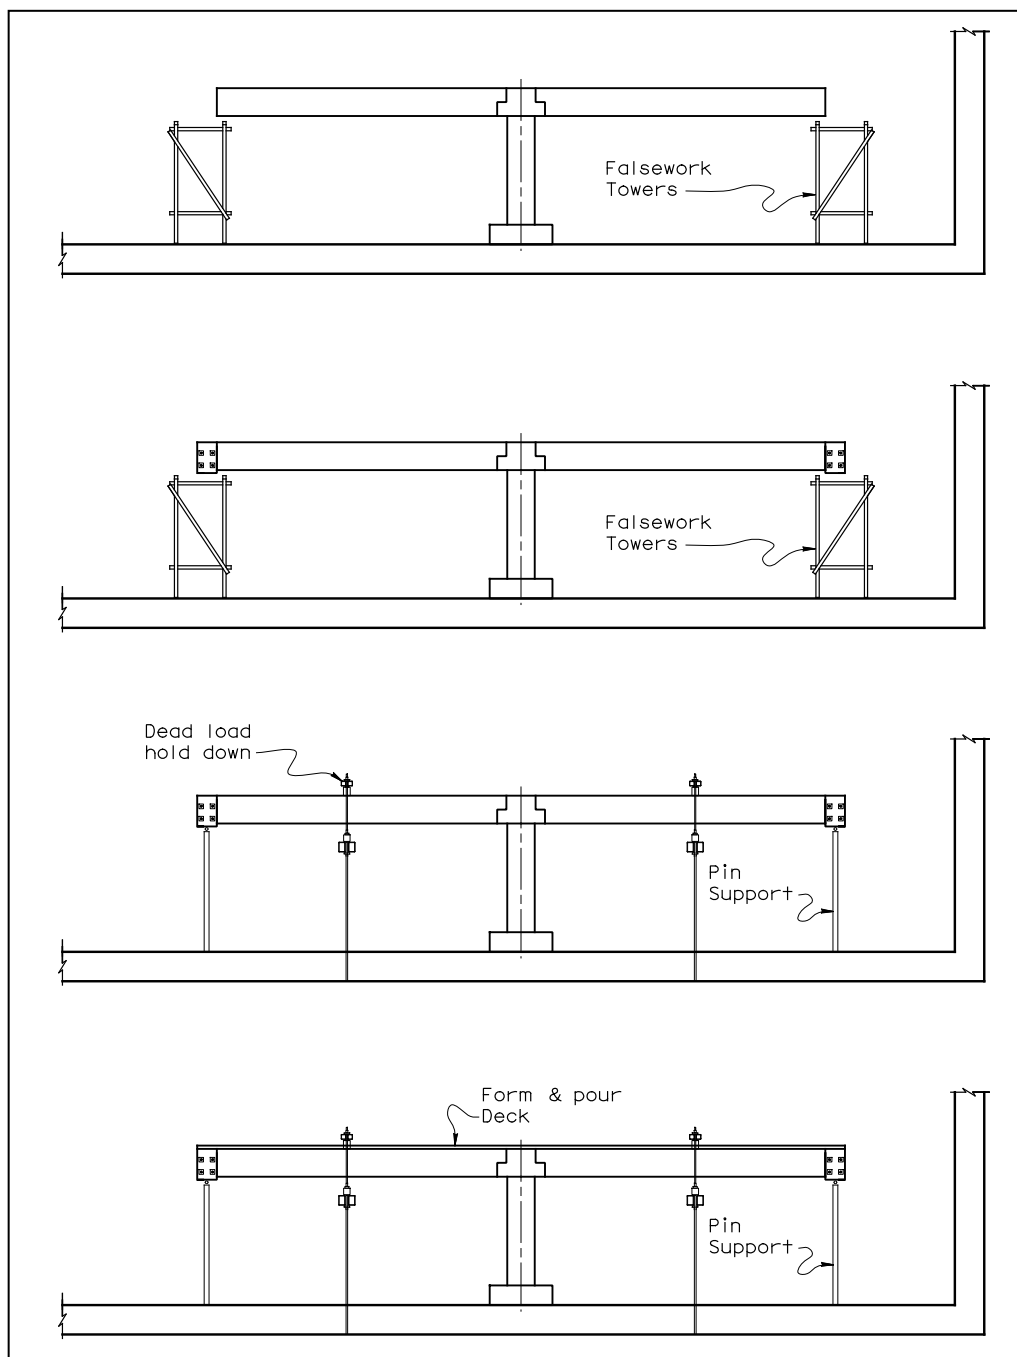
Schematic of Construction Sequence Used for Building the Test Unit
